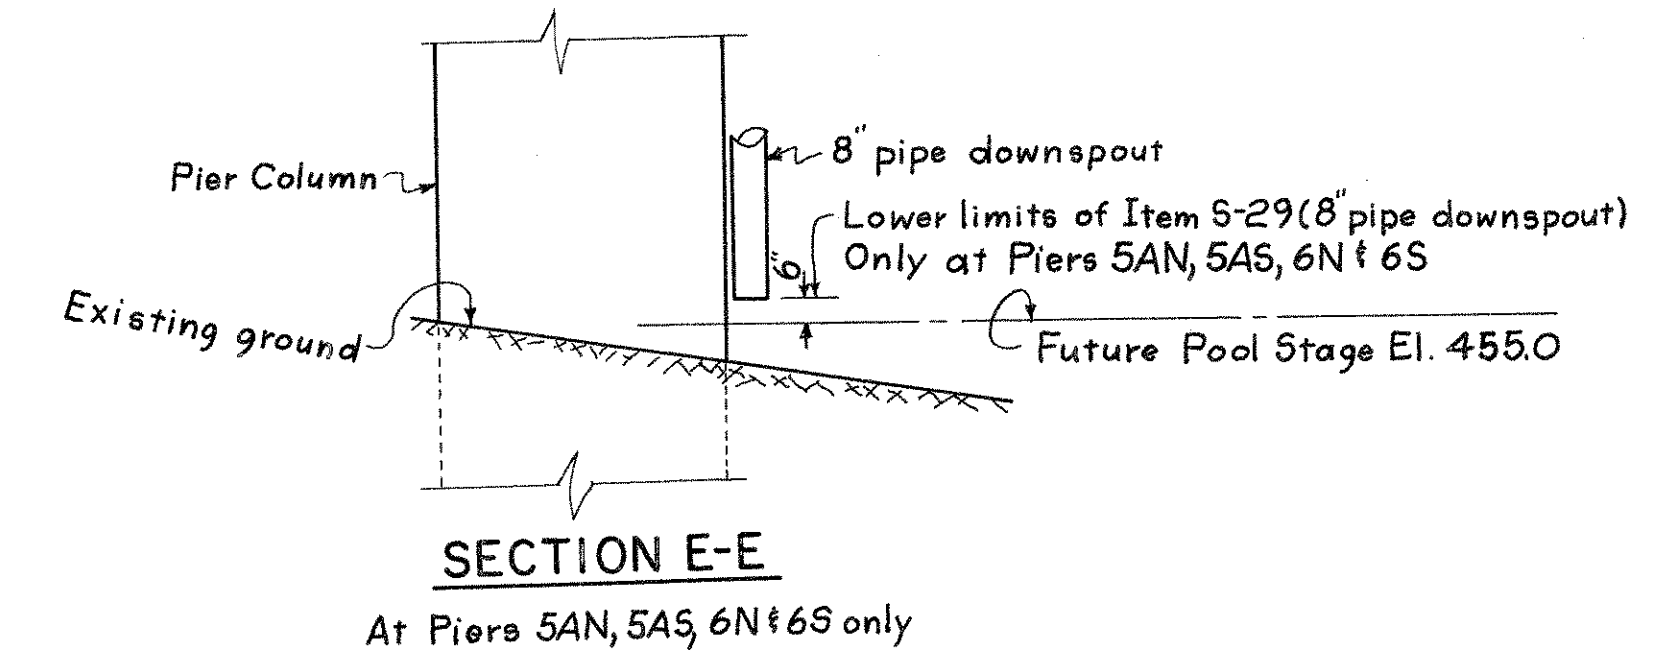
DETAIL SHOWING LOCATION OF DOWNSPOUTS ON COLUMN - BRIDGE NO. IR & IL
